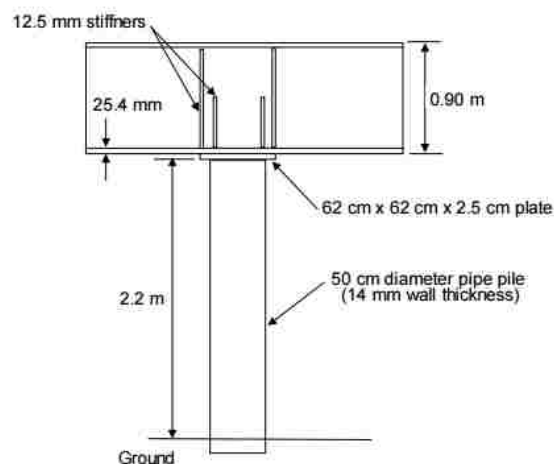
North Pier Pile and Pier Deck General Dimensions (Bray, et al. 2012)
